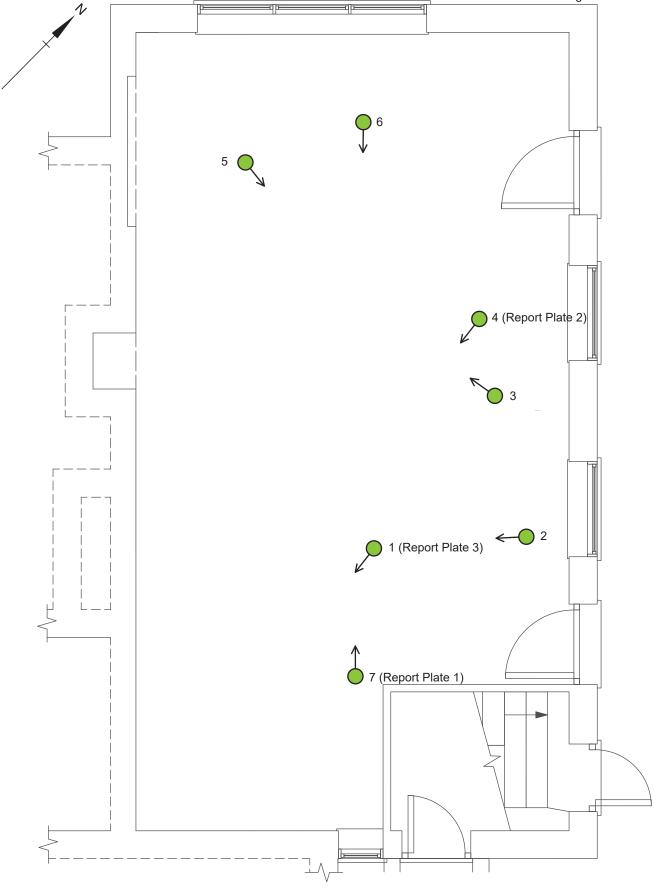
Ground floor ceiling prior to works 1:50 (After Native Architects, Drawing 305)
